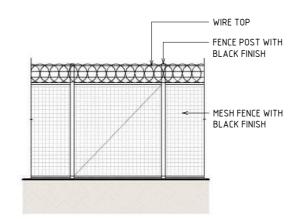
DETAIL – RAIL LUBRICATOR – EXISTING CHAIN LINK FENCE AND ACCESS GATE
